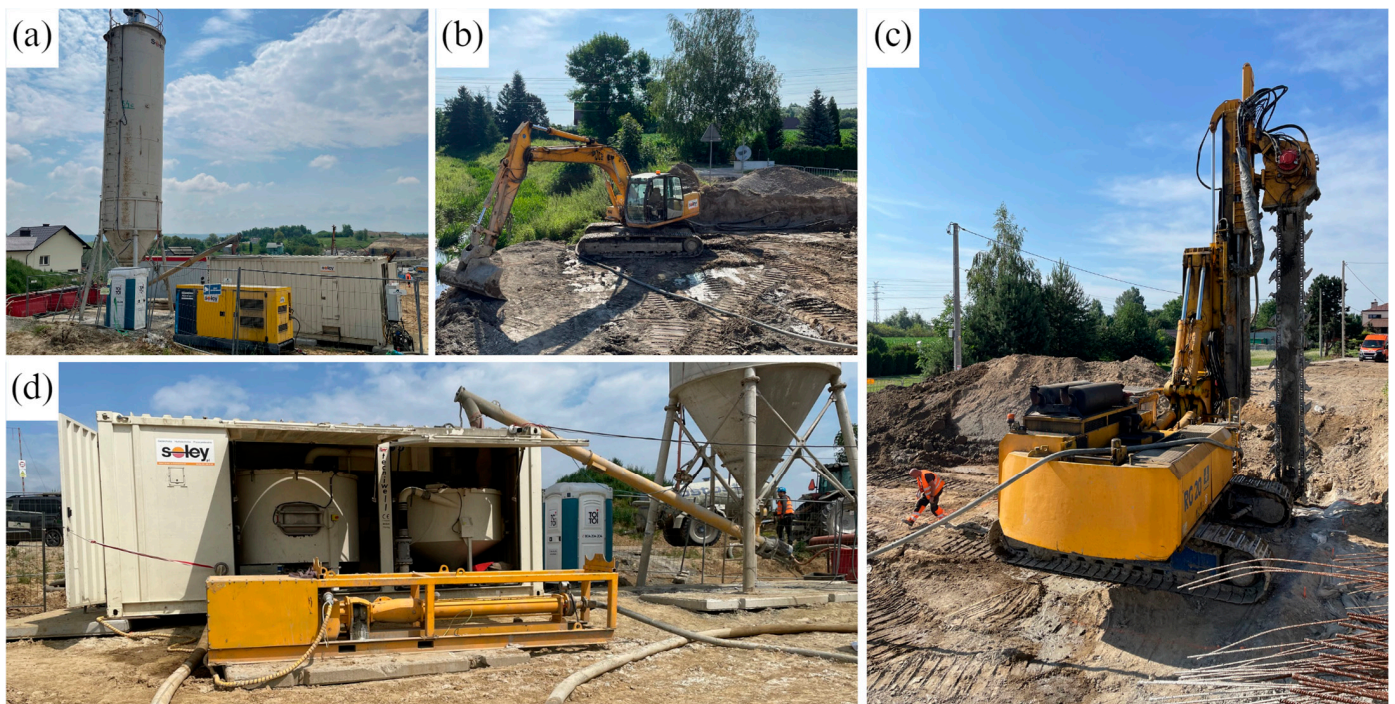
Construction site facilities for CDMM. Own elaboration. (a) Silos and power generator; (b) Excavator; (c) Trenchmixer; (d) Mixing and pumping unit.
